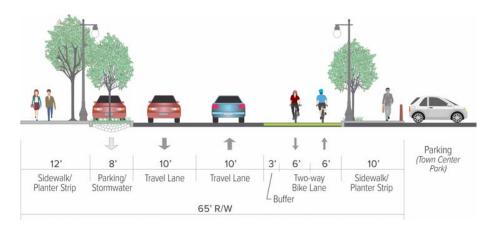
TOWN CENTER PLAN CROSS-SECTIONS (CONT.)
